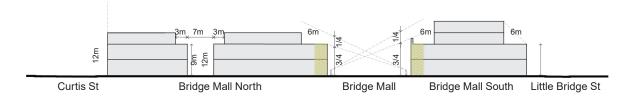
Existing built form section for Sub-Area 3: Bakery Hill - Section G
